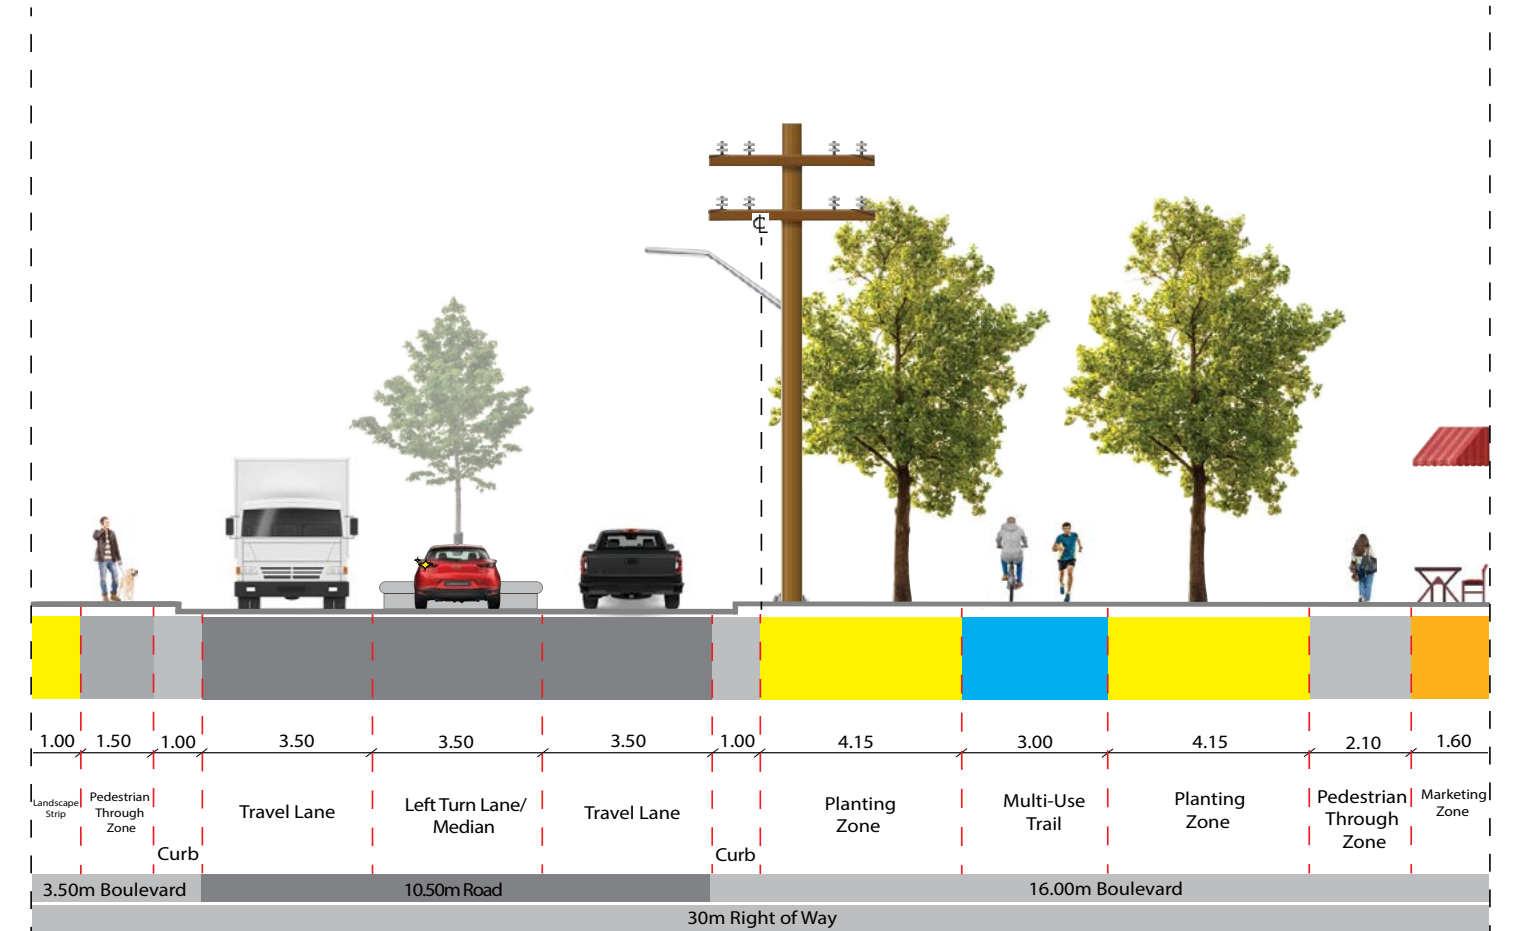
West Broadway Cross Section Between Banting Drive and Dawson Road
